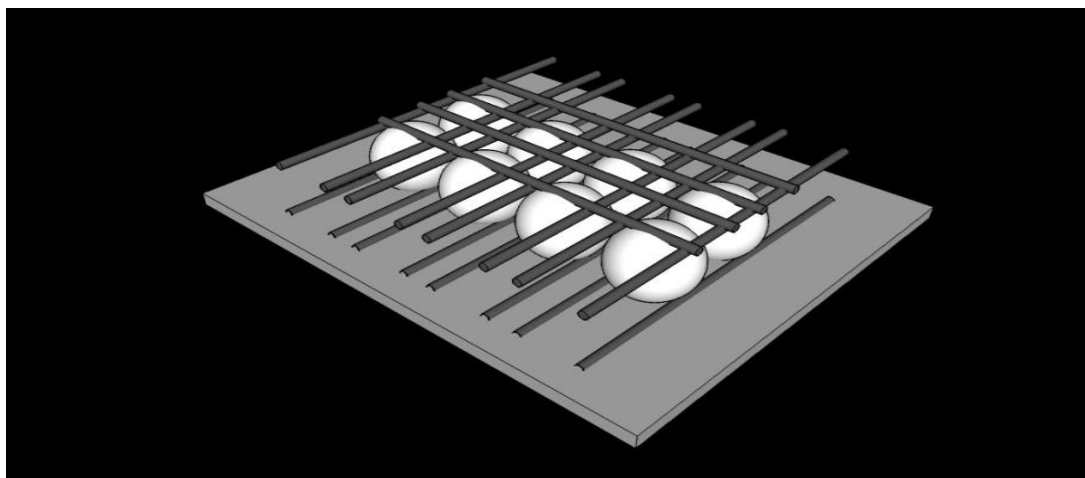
3D Section of the BubbleDeck Slab
